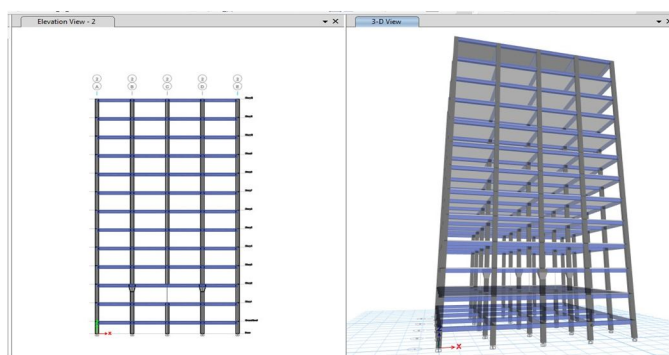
Model F- Building with Floating Column @ 1st floor and with Y-Shaped column
